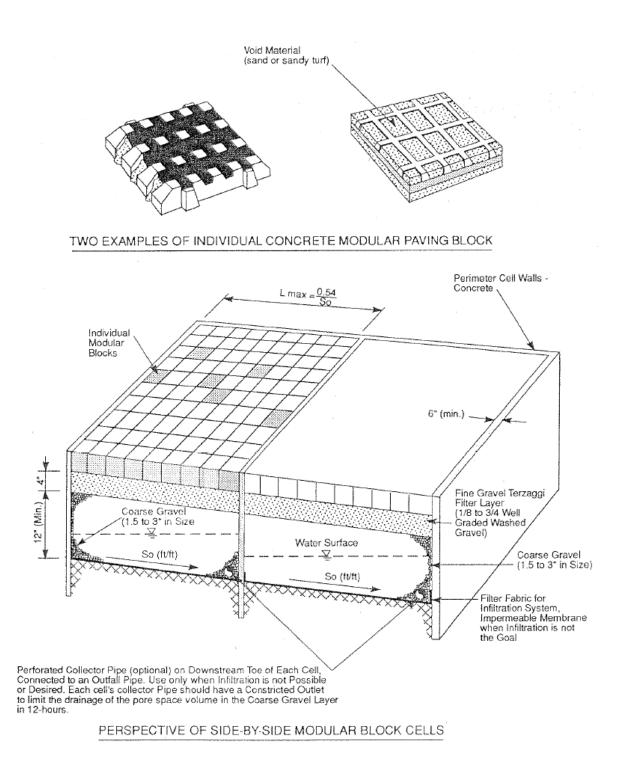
Design Schematic For Modular Block Porous Pavement
